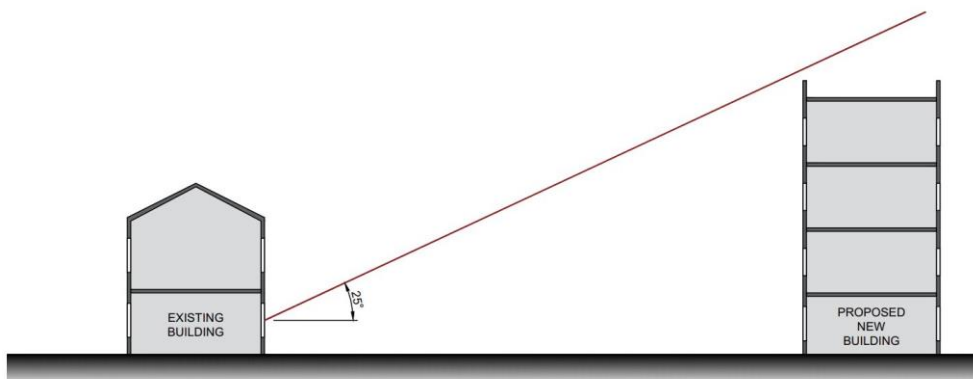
25° Angle test for Daylight Impact to Existing Buildings
